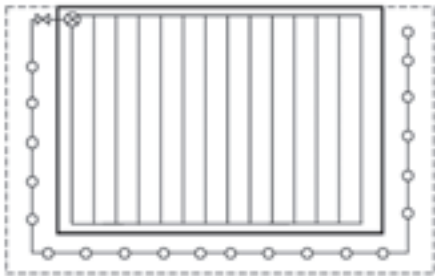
(a): Sprinklered canopy on 3 sides of a building.
